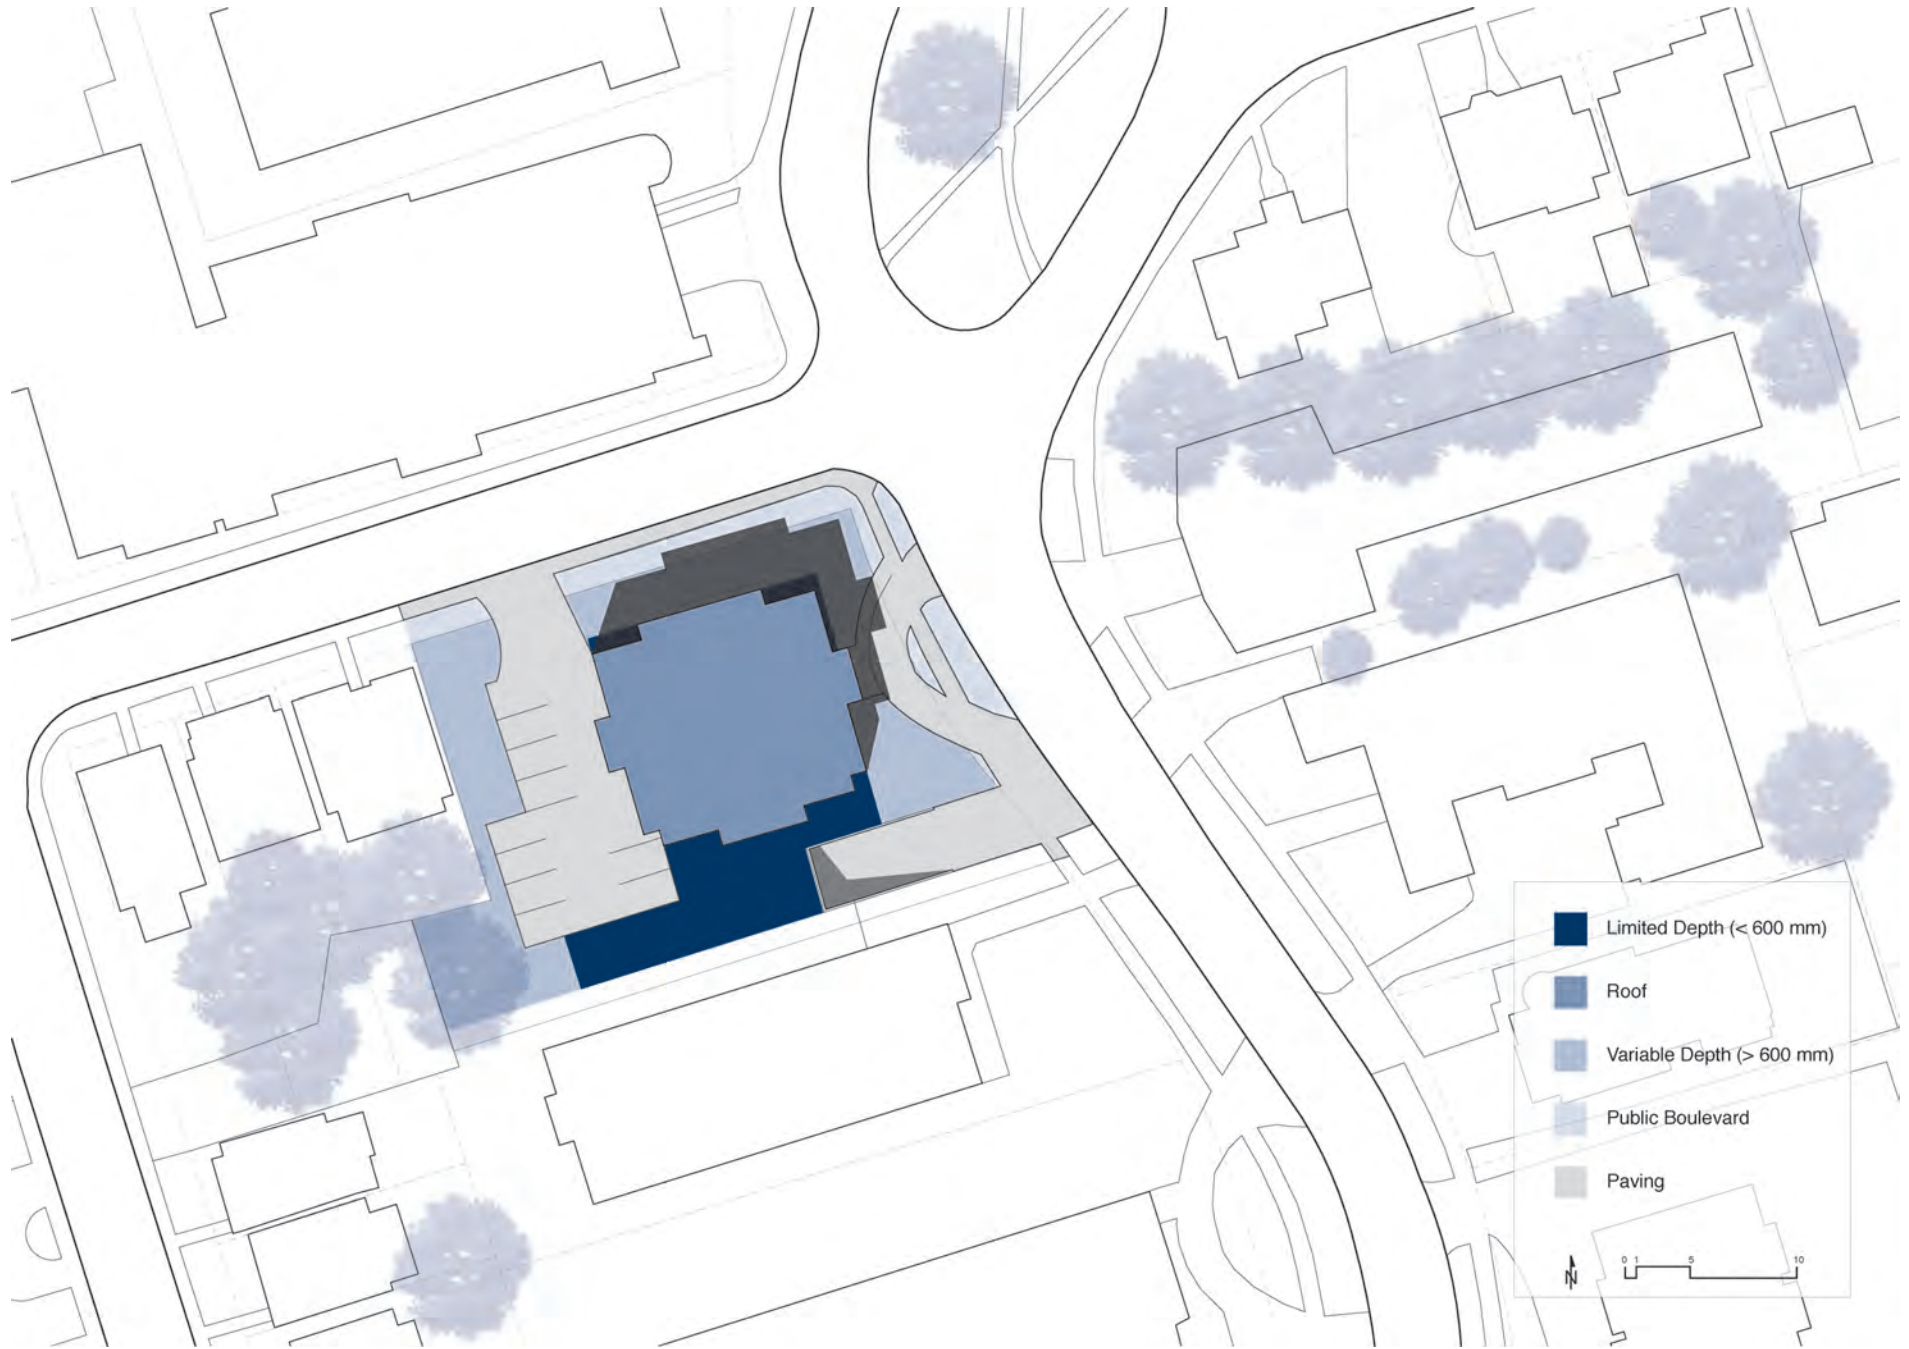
Tower A – Compact Urban Site is an example of tower buildings developed on small parcels of land in existing urban neighbourhoods.
